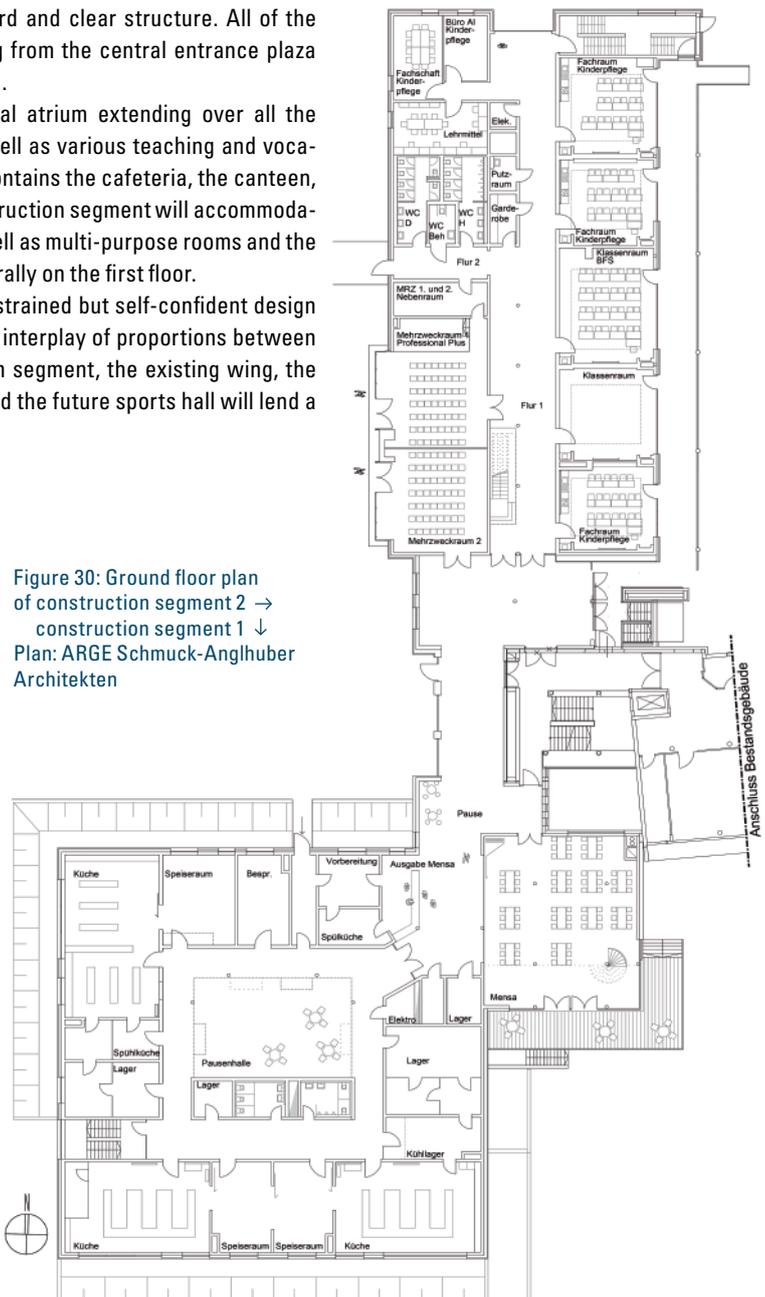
Ground floor plan of construction segment 2 → construction segment 1 ↓
